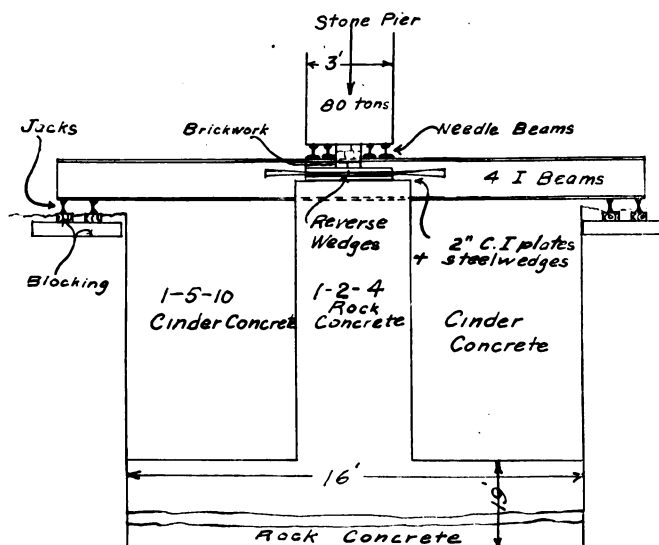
Underpinning Details, Section A. Dorchester Tunnel
